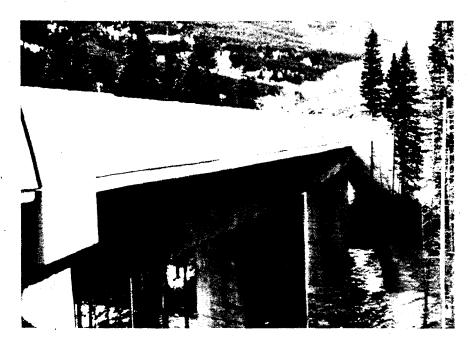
Typical Cast-in-Place Concrete Box Girder Bridge
